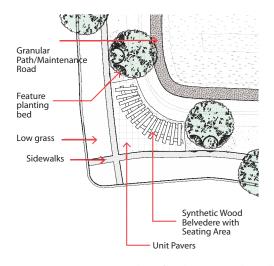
Demonstration Plan of Pedestrian Node and Belvedere SWM ponds
